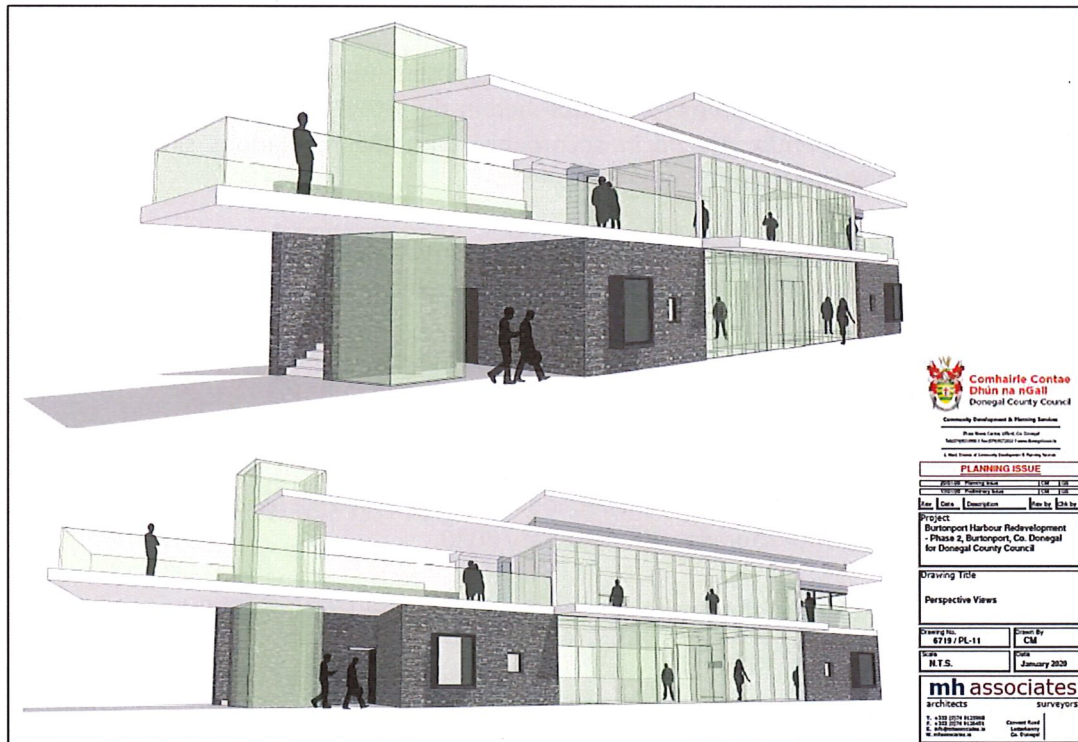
Perspective View of the proposed Harbour Building - Building 1 (published 23/01/2020)
